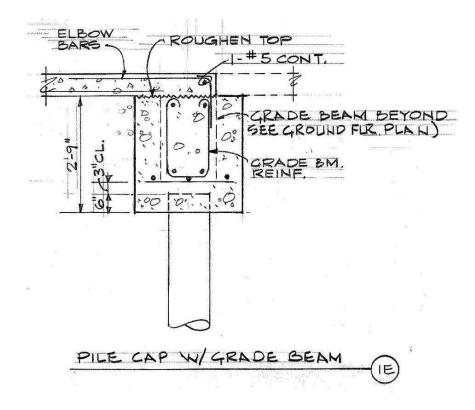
Long Term Care Wing – Deep Foundations/Connections (Section 1E/S-2)
